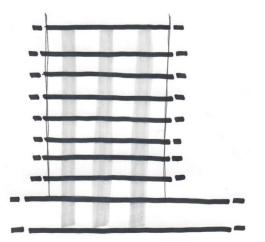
Axonometric of building indicating zoning and connection between levels (by Author)
